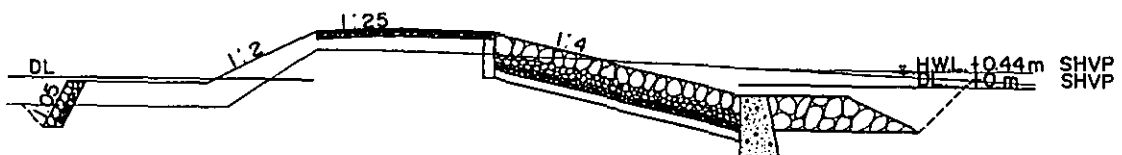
NEW STRUCTURE OF SEA-DIKE SLUICE TYPE A(200x150)
